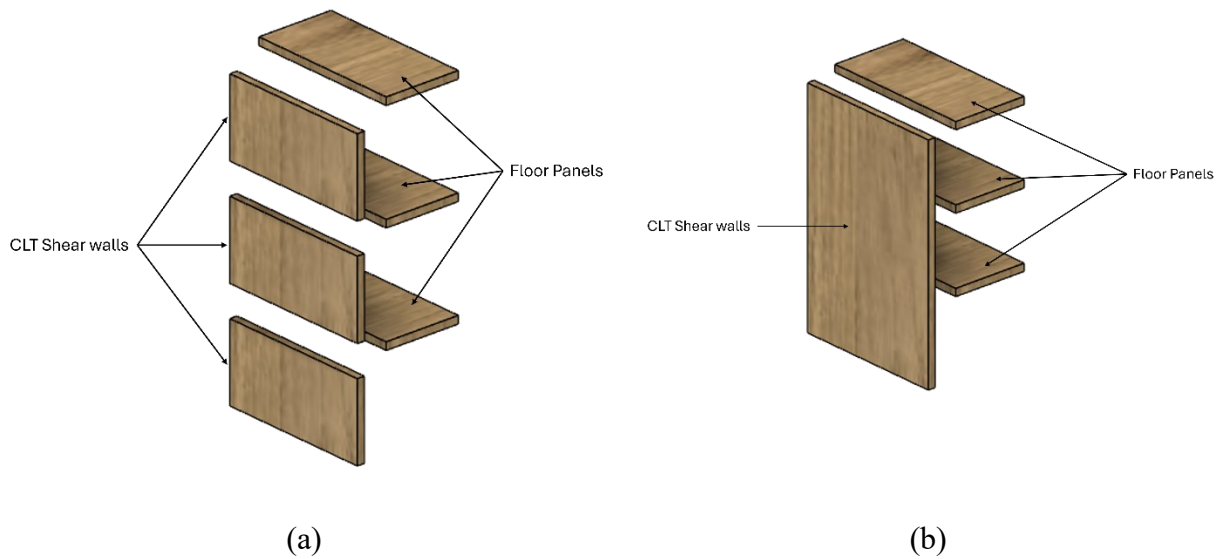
(a) Platform Type CLT Construction (b) Ballone Type CLT Construction
